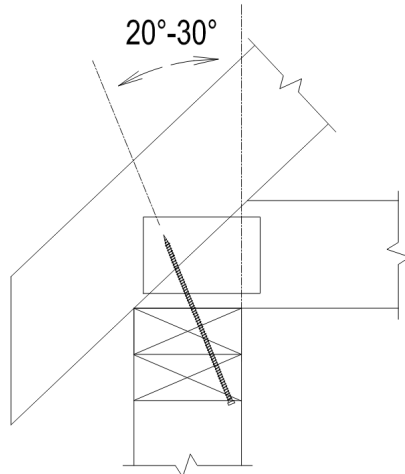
INSTALLATION OF FASTENERS AT AN ANGLE IN DOUBLE TOP PLATE TO TRUSS/RAFTER/JOIST APPLICATIONS
